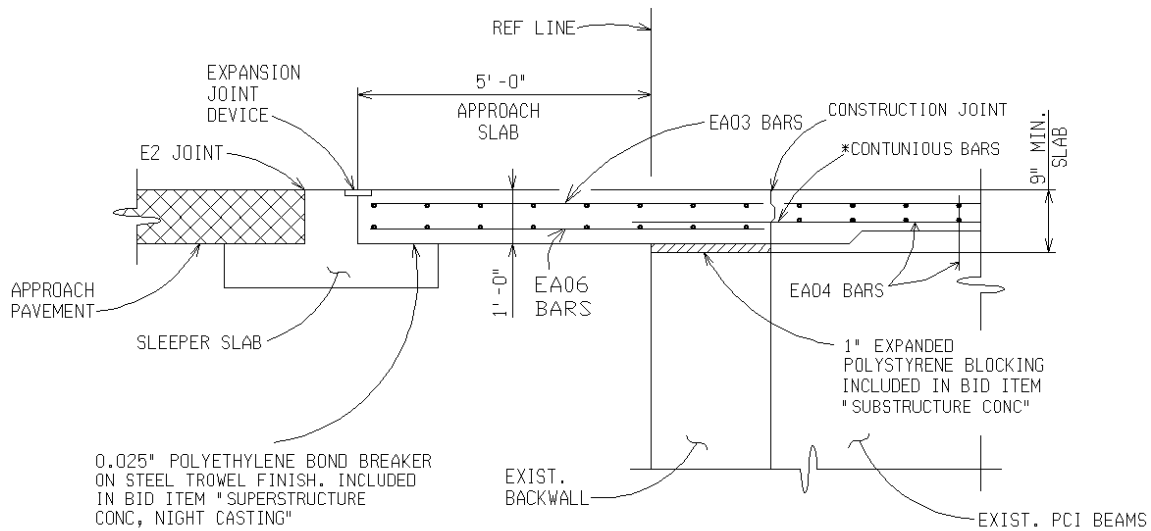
Proposed independent backwall configuration with deck sliding over backwall, i.e. continuous bottom layer reinforcement with discontinued top layer
